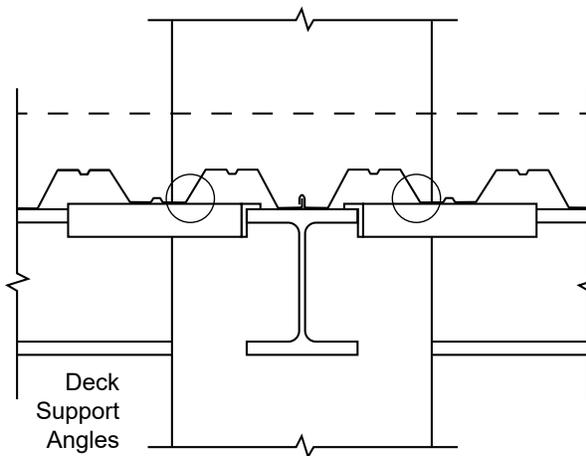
COLUMN DETAIL REQUIRING DECK SUPPORT ANGLES
